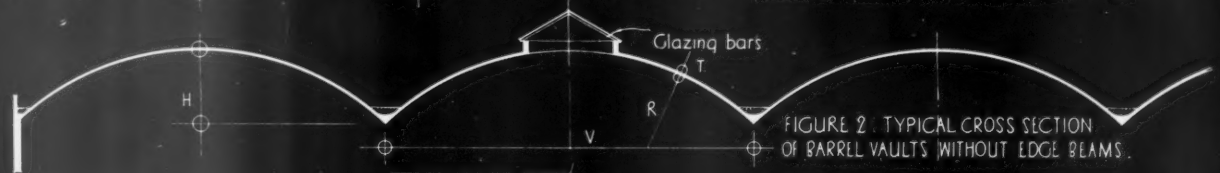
TYPICAL CROSS SECTION OF BARREL VAULTS WITHOUT EDGE BEAMS.
